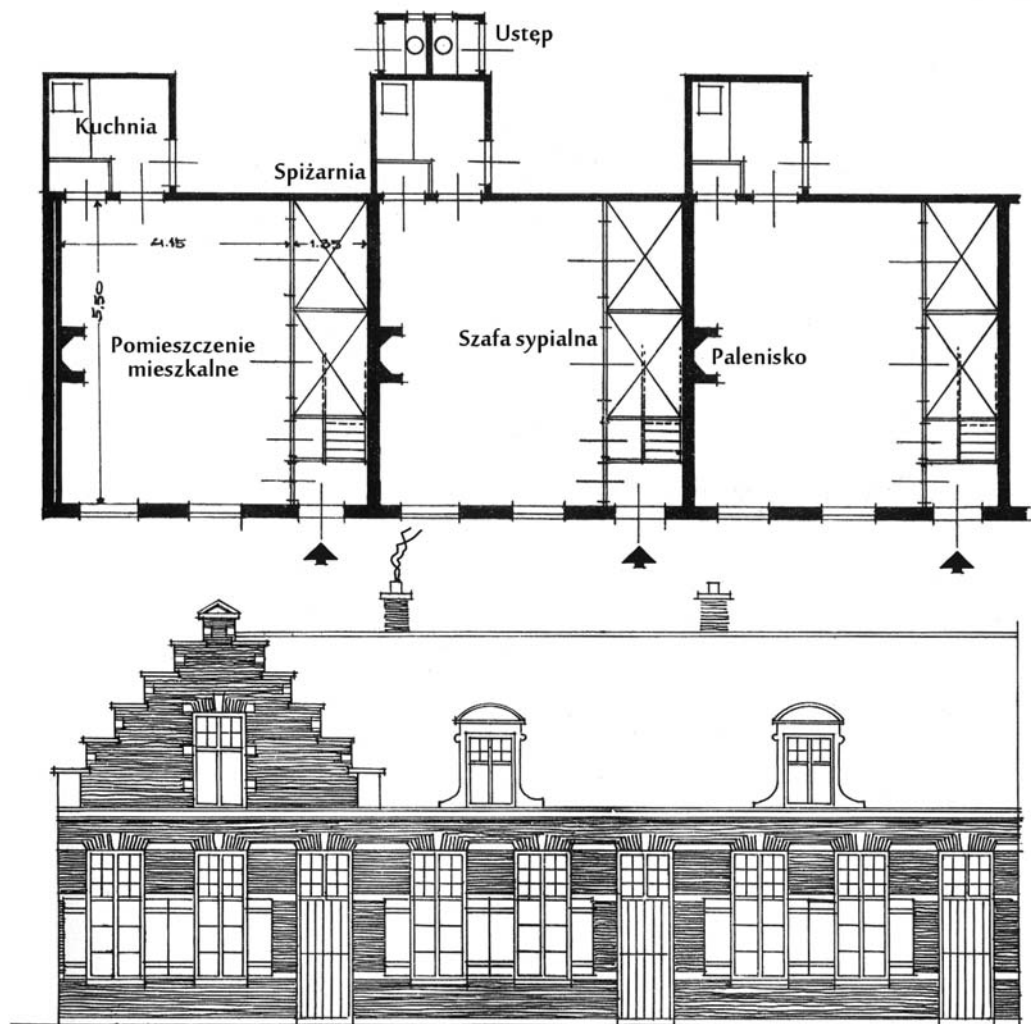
Municipal buildings in Edam and Volendam (Northern Netherlands province, 1905–1909) – projection of the ground floor (at the top) and front elevation (at the bottom). Source: [1, p. 12]
